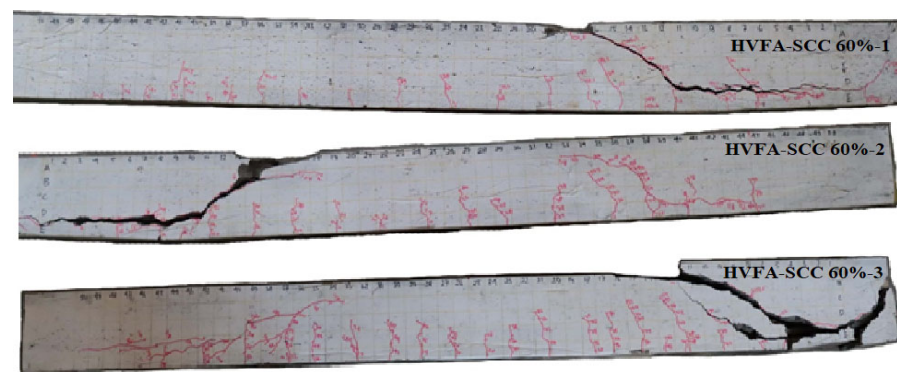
Crack pattern of 60% HVFA-SCC concrete at ultimate shear force.
